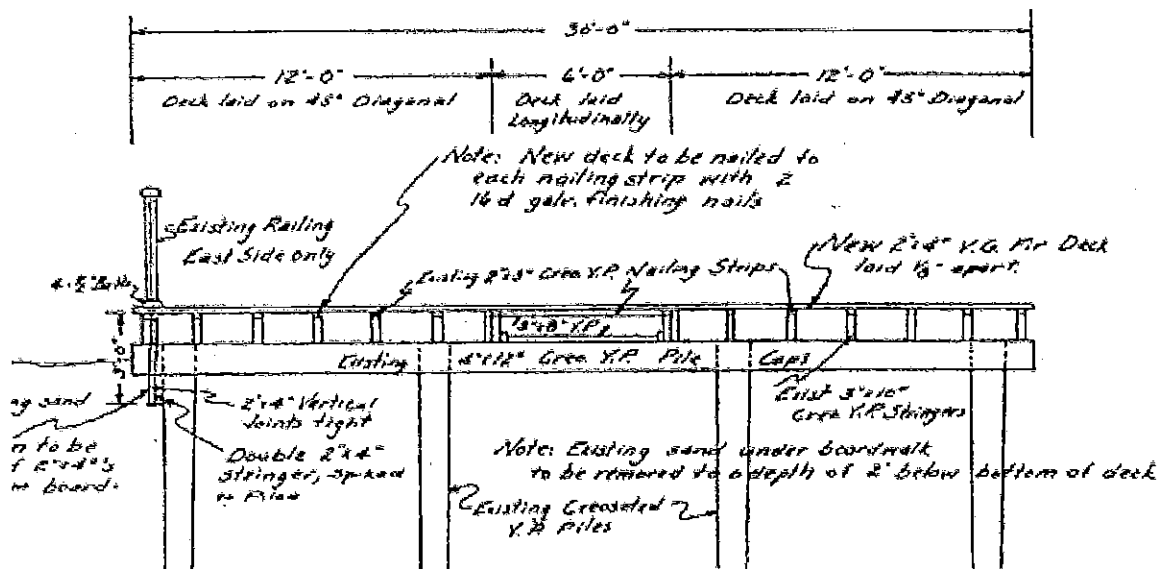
PREVIOUSLY EXISTING BOARDWALK SECTION
